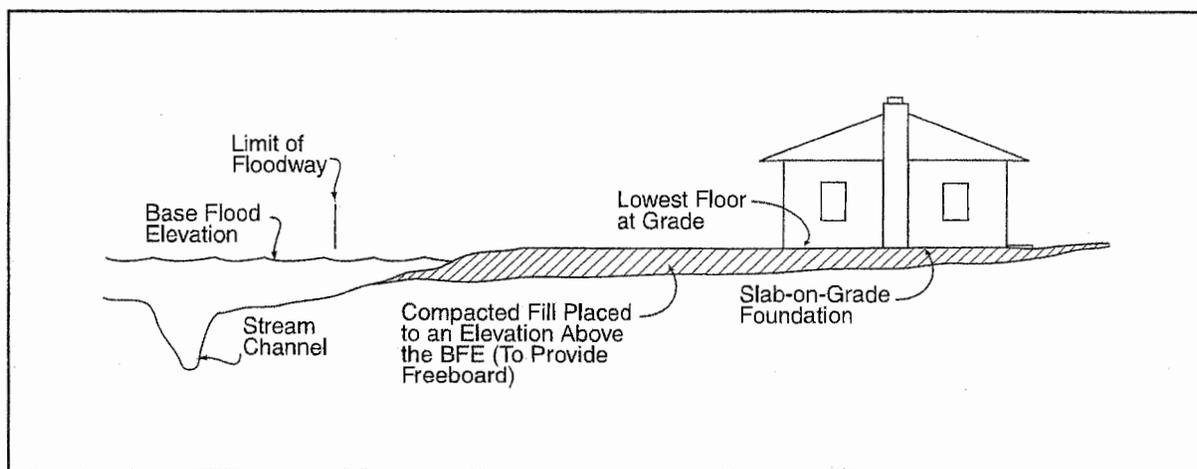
Structure on a slab-on-grade foundation. The lowest floor is typically slightly higher than the surrounding grade.
